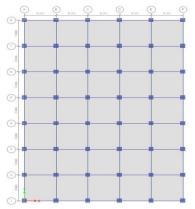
Plan view of modelled reinforced concrete conventional structure
